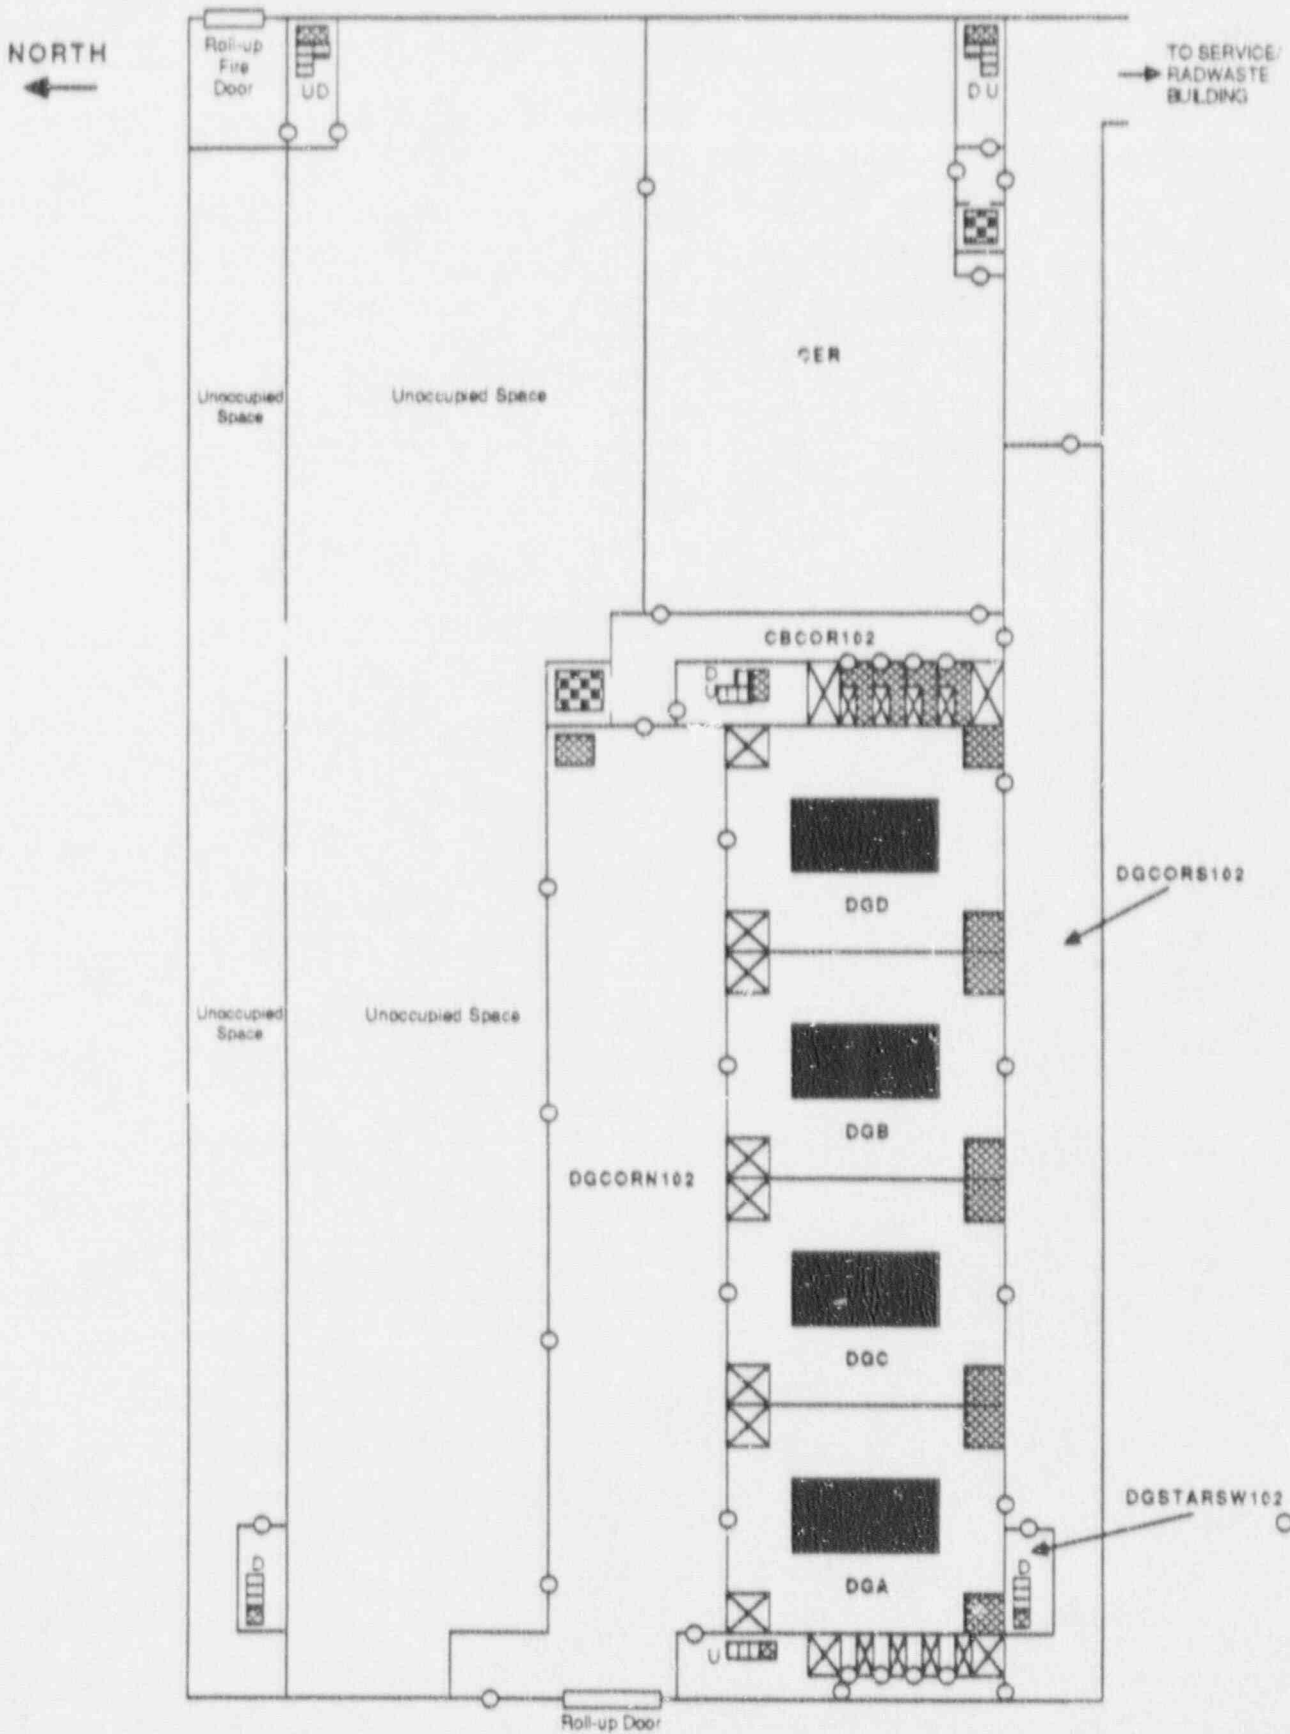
Hope Creek Control/Diesel Building Elevation 102'-0"
